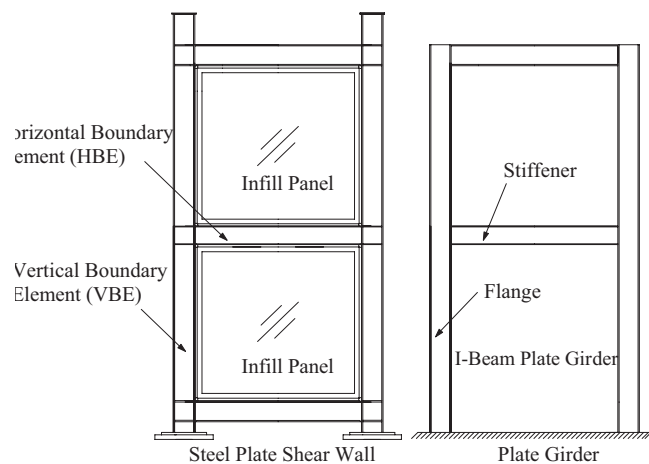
Typical steel plate shear wall and analogous vertical cantilever plate girder.
